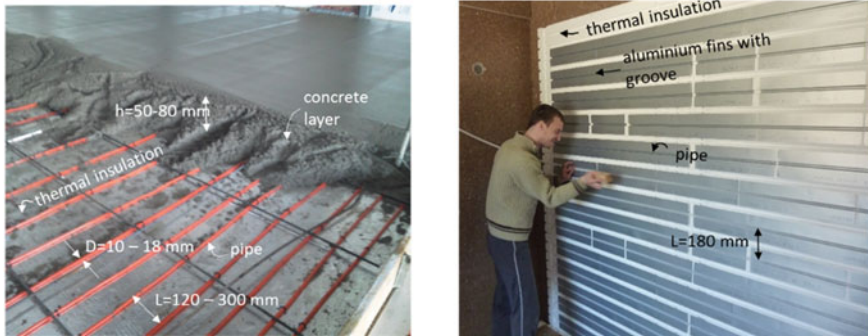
Wet floor (left) (www.mikesheating.com) and dry wall type of radiant heat emitter (right)
